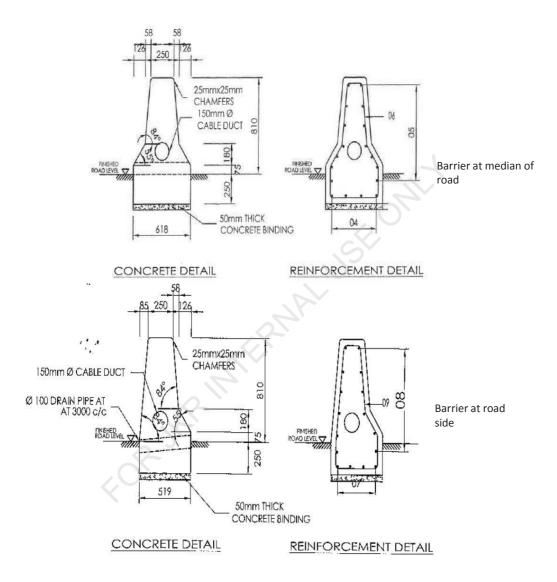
Typical Cross Sections for Reinforced Concrete Barrier (810mm)
